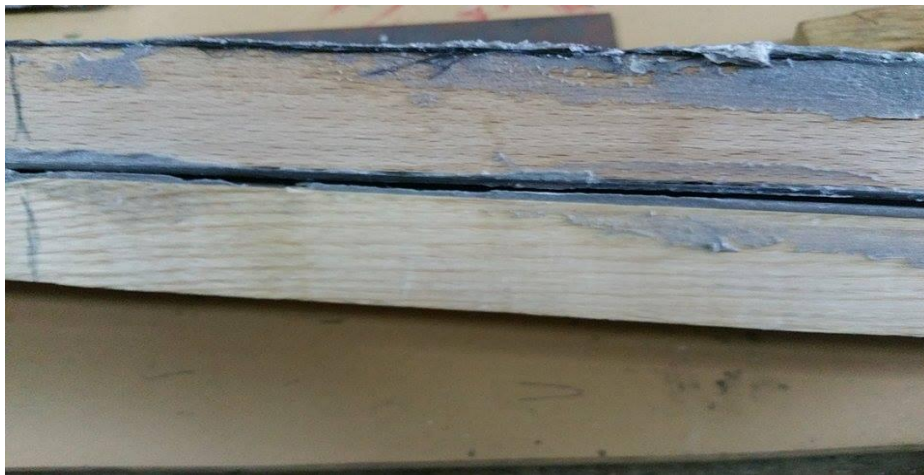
Tension failure of a reinforced ash and beach wood beam with one GFRP sheet (in the middle of the beam)
